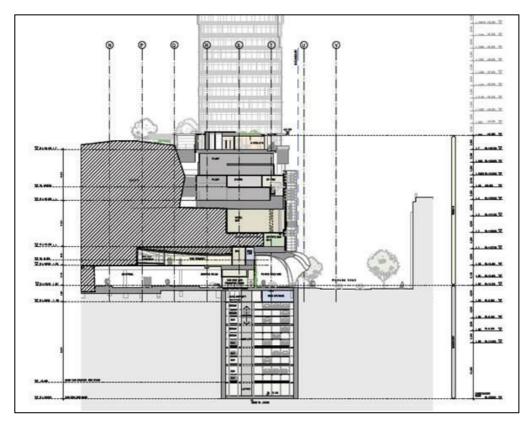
Section D02 through Proposed Car Stacker (FJMT Studio, Sheet No. AF5102)
